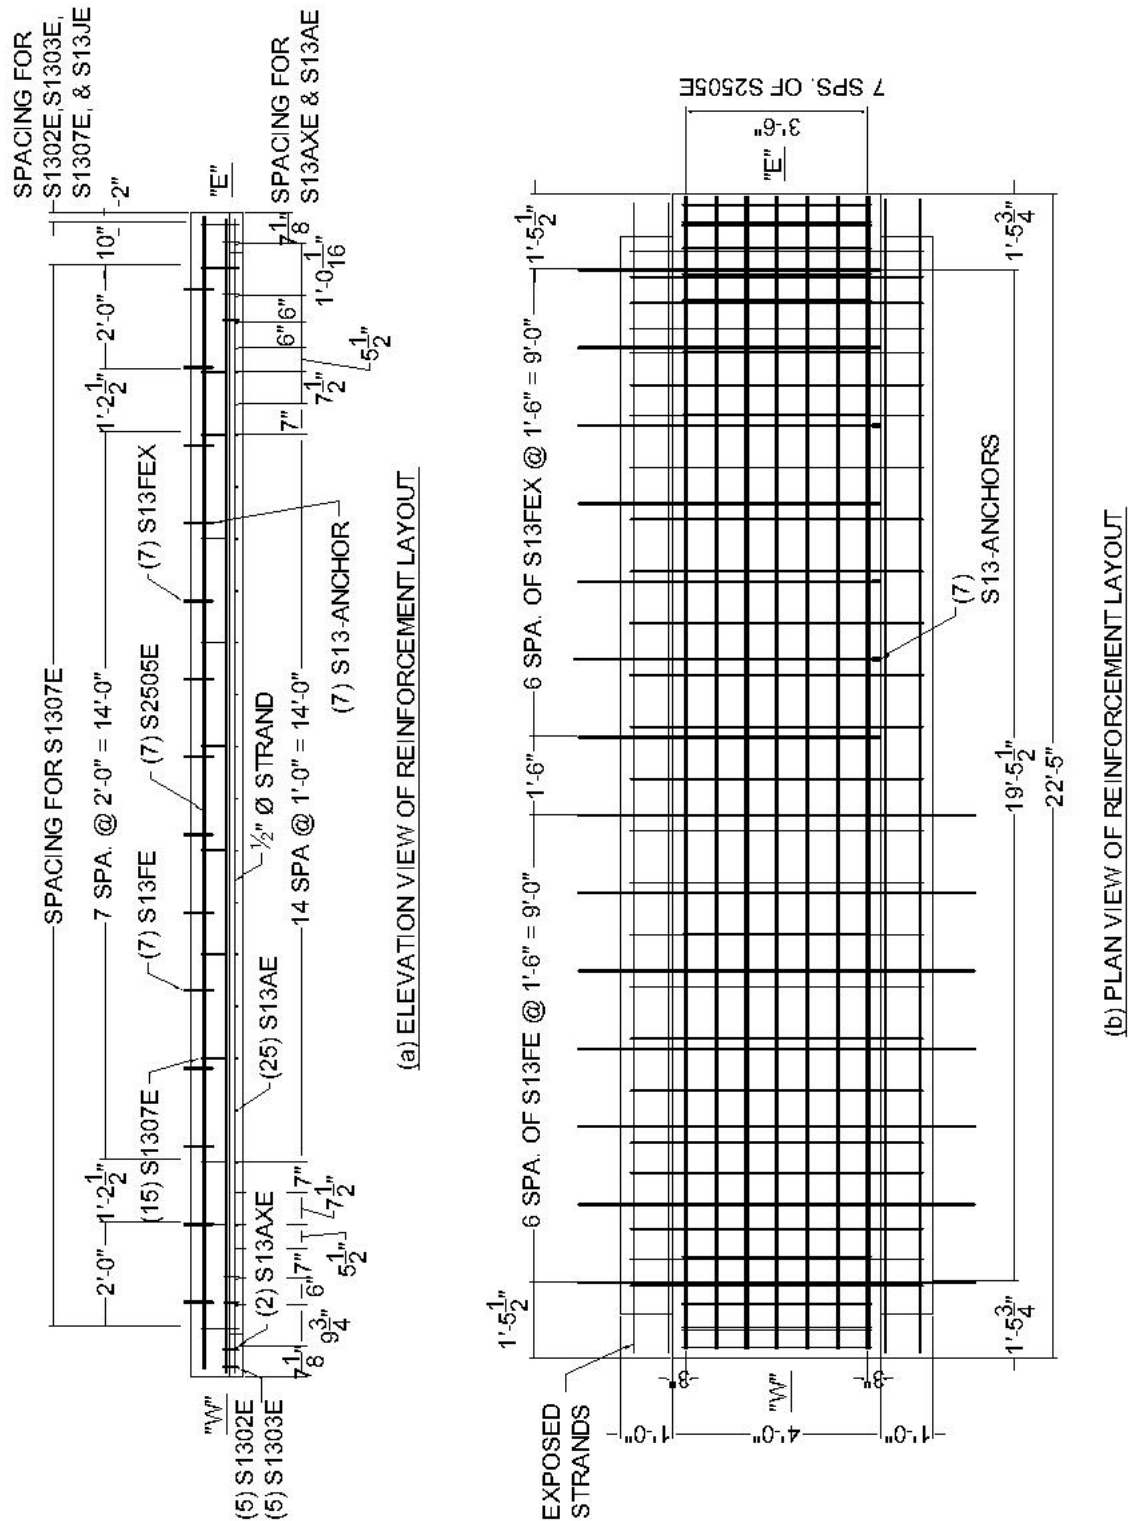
Elevation and plan views of the reinforcement layout for precast beam 1N in the Concept 2 laboratory bridge specimen
